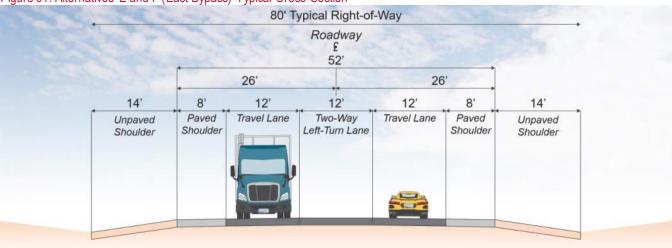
Alternatives E and F (East Bypass) Typical Cross-Section
